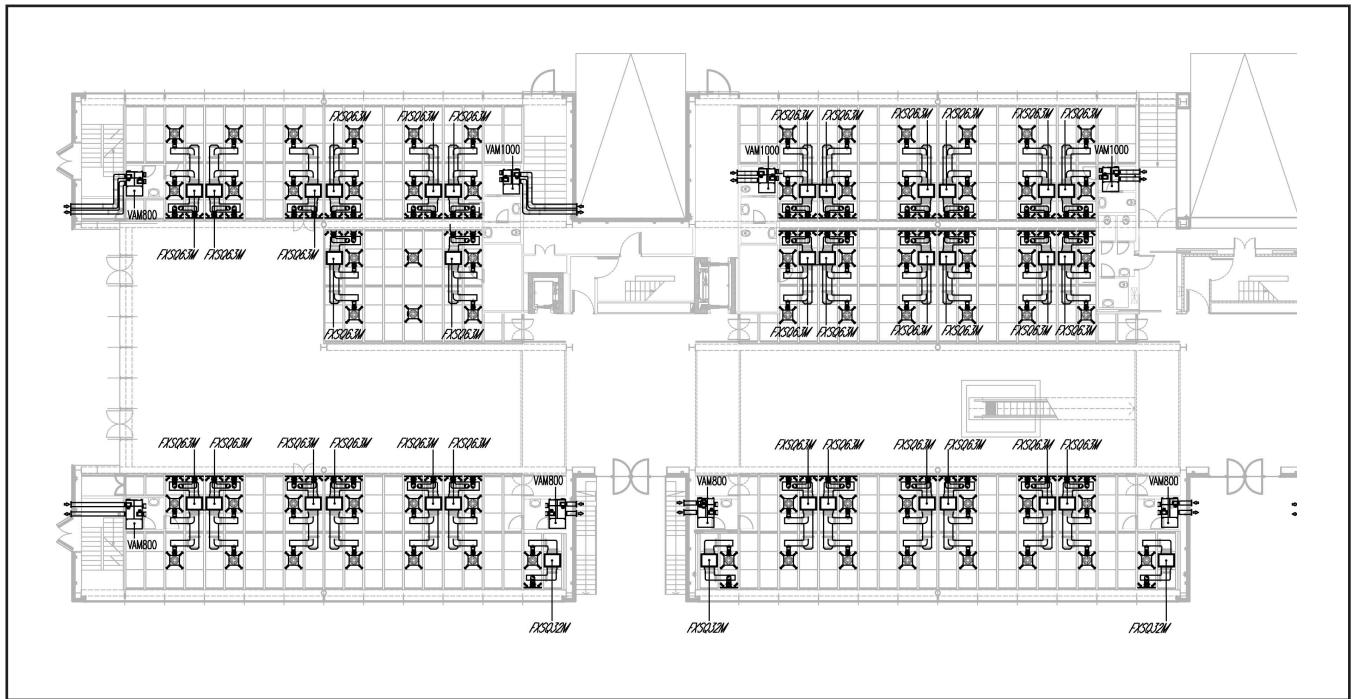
Tendenza Bldg. Typical Floor Plan (1)
